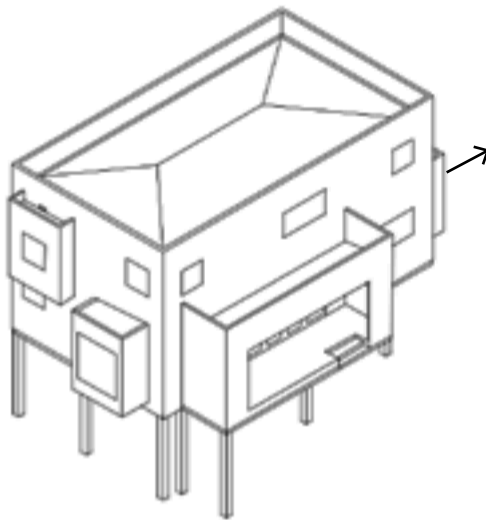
Elevating the design above the ground on piles allows for further possible expansion downwards. This could be particularly useful on sloped sites.
